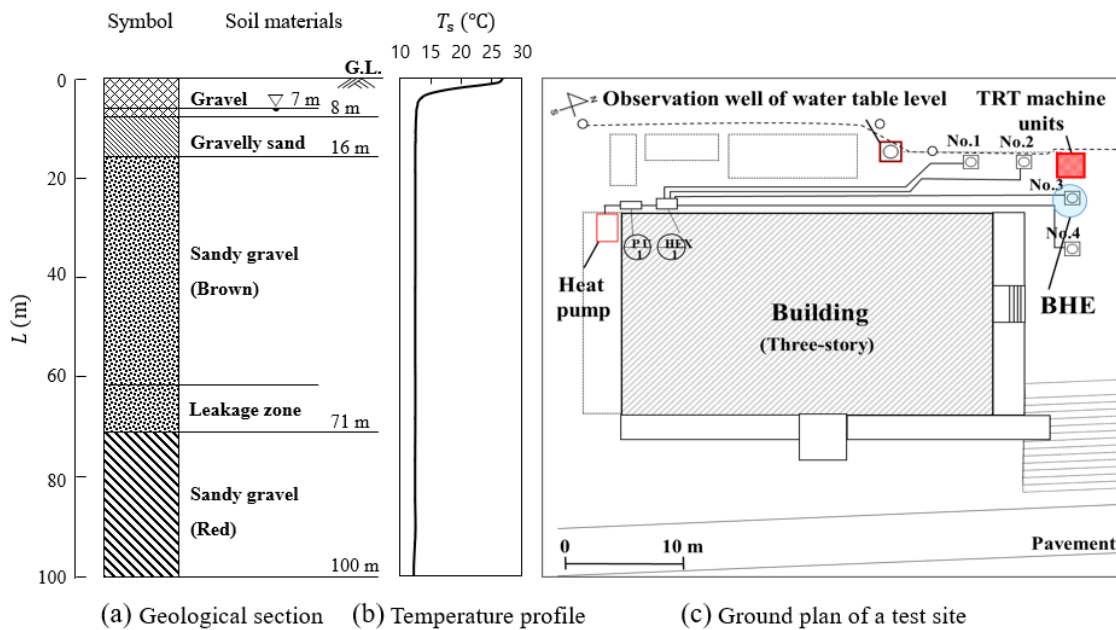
2 Geological section and ground plan of the test site: (a) geological section at a test site, (b) vertical ground temperature profile, and (c) ground plan of a test site
